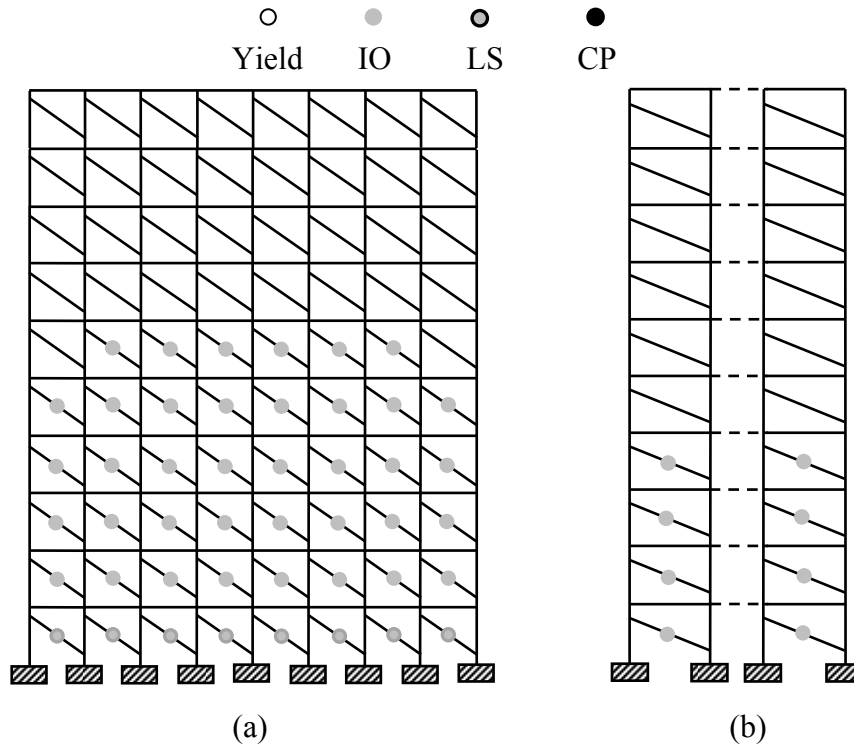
Hinge pattern at performance point under DBE of ten storey RC frame building with URM infills, designed as SMRF as per relevant Indian Standards: (a) typical longitudinal frame; (b) typical transverse frame.
